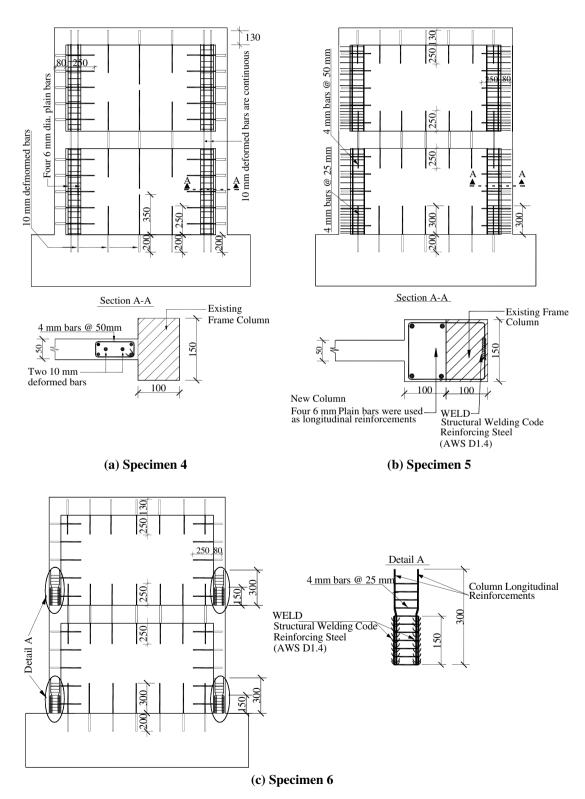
Local strengthening technique details of specimen 4, 5 and 6 (Dimensions in mm.).
